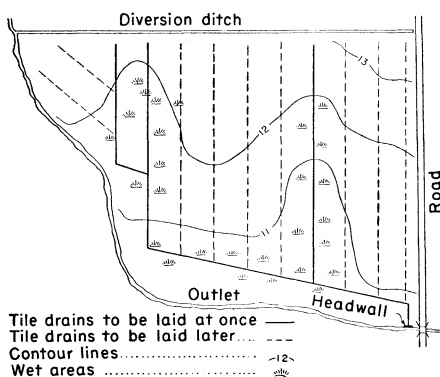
Plan for a complete system of tile drainage. Random drains are to be installed at once in wettest parts of field and parallel lateral drains to be installed later.
